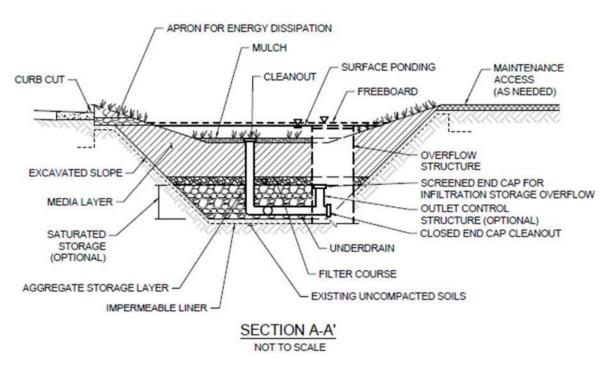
Typical Plan and Section View of a Biofiltration BMP
